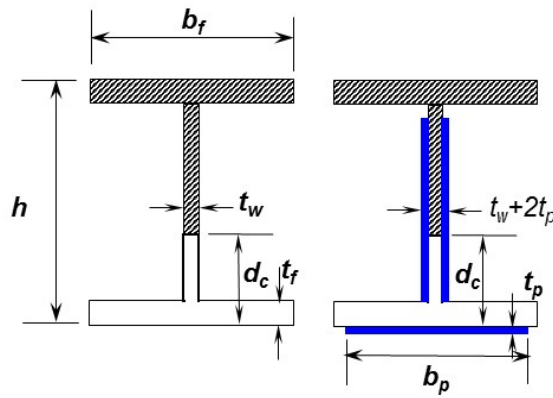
Steel beam section loss in the bottom flange and web and the repaired beam.
